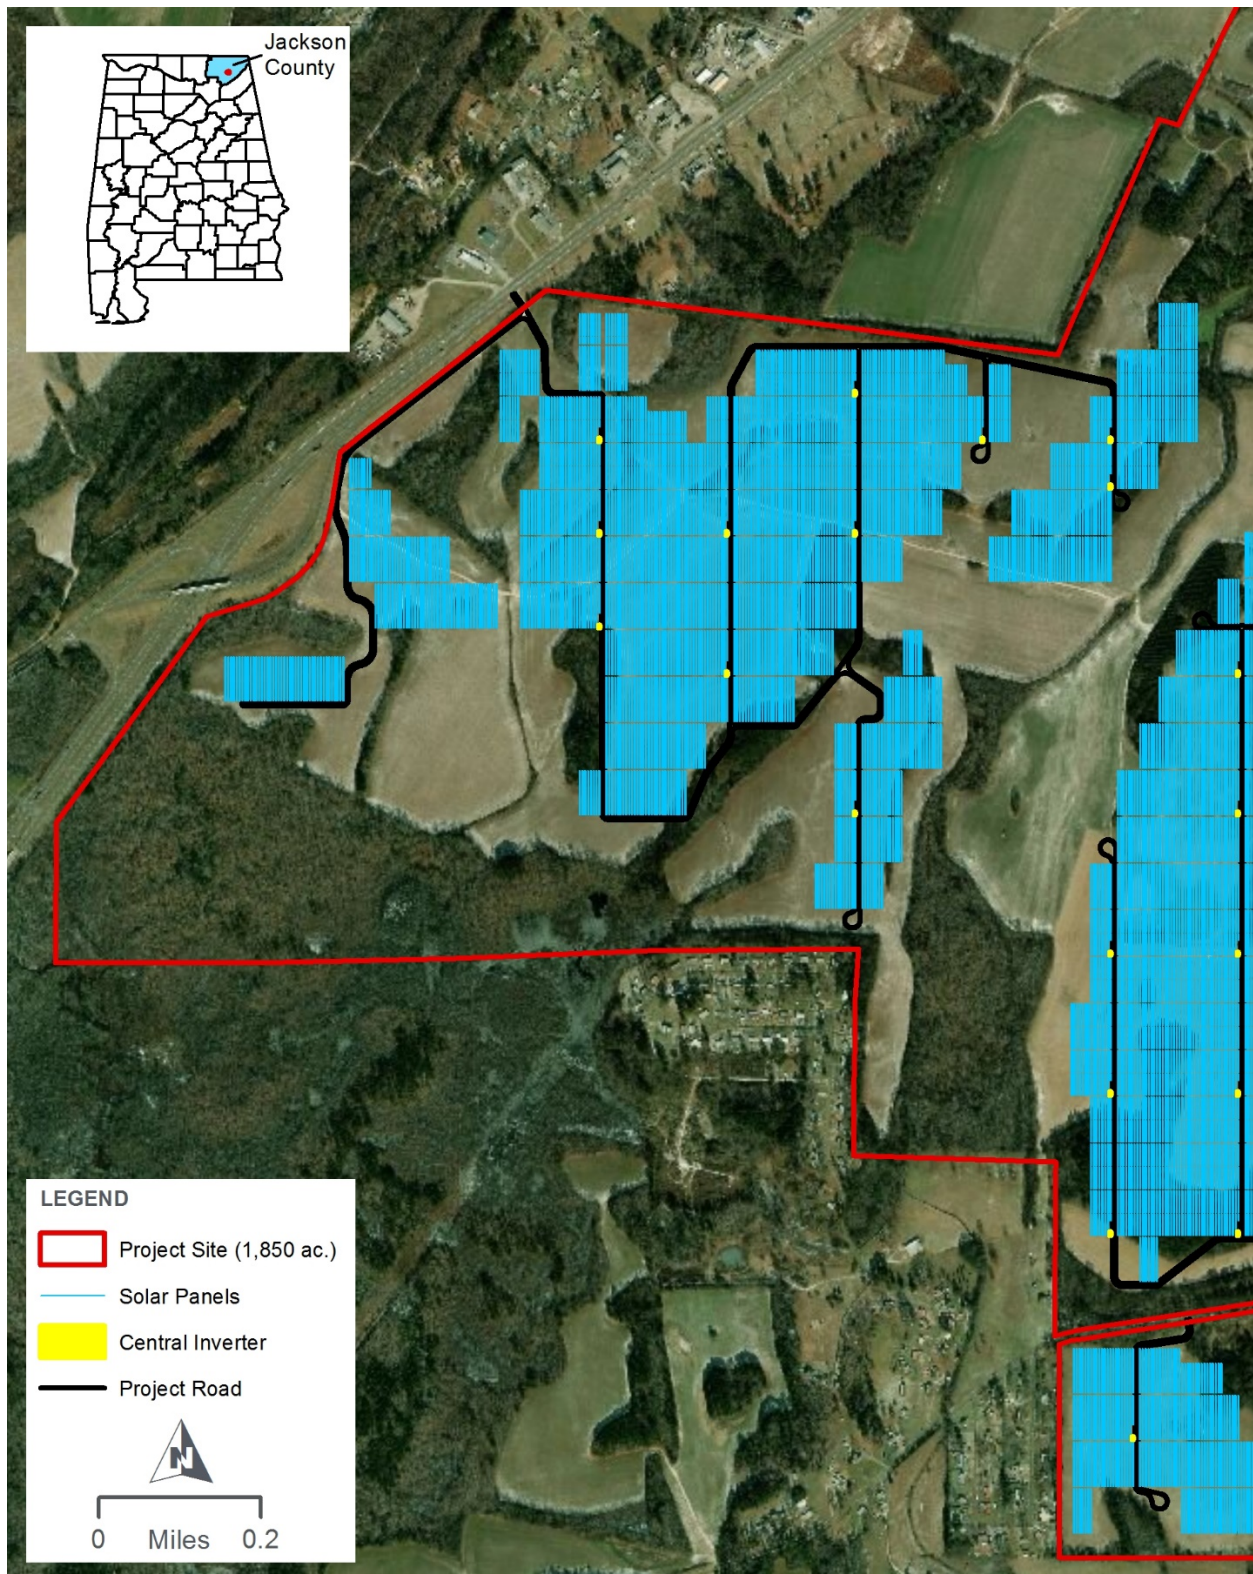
Aerial photo showing the proposed layout of the Bellefonte Solar Energy Center components (West)
